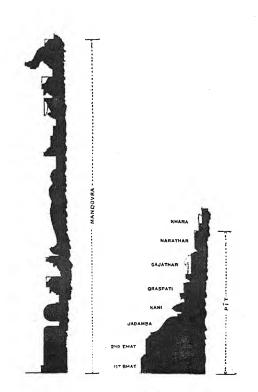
PLAN AND DETAILS, TEMPLE, SUNAK
